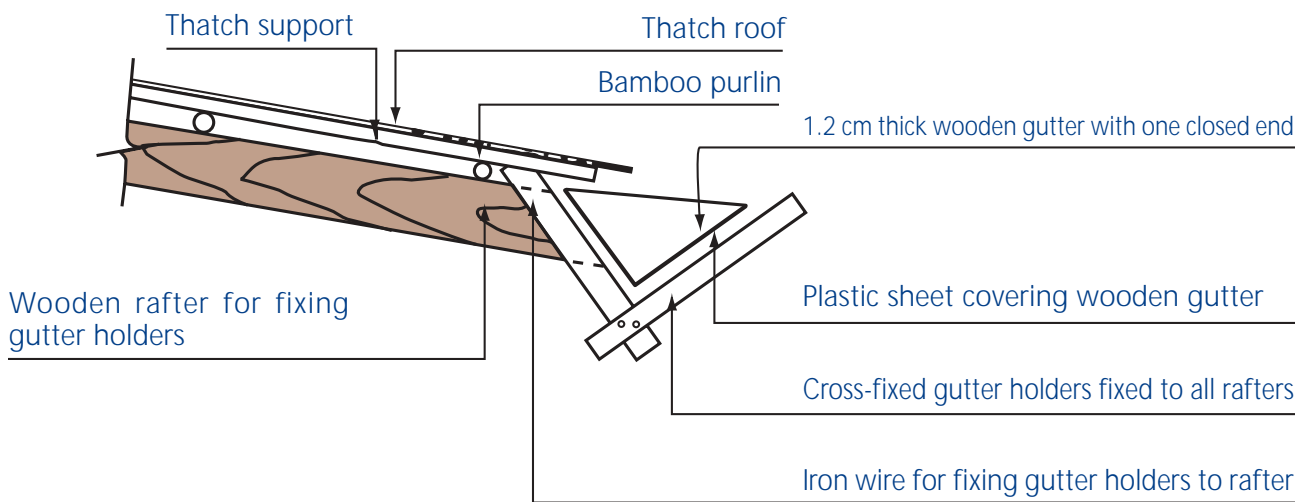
Fix the "V" shape wooden gutter to bamboo roof structure.
